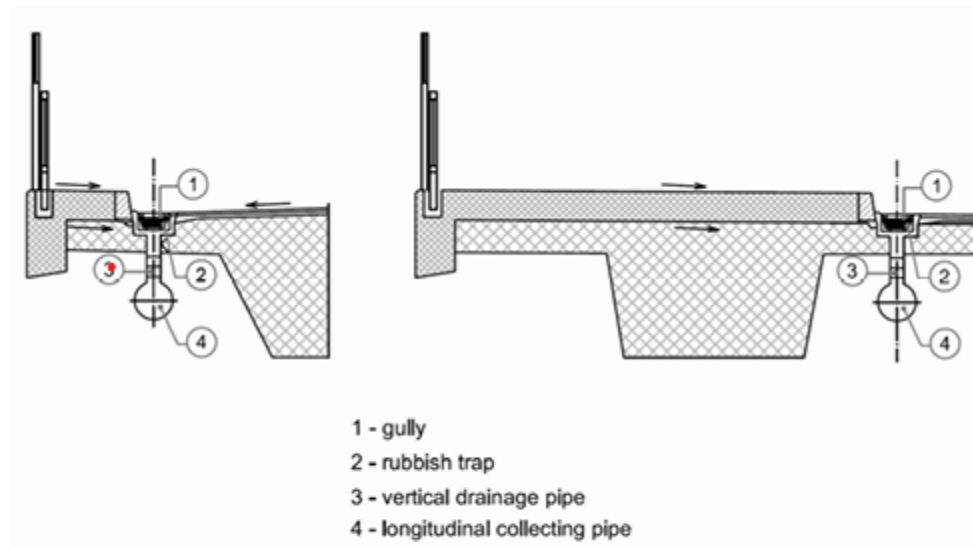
Methods of placing drainage elements with respect to bridge deck cross section
